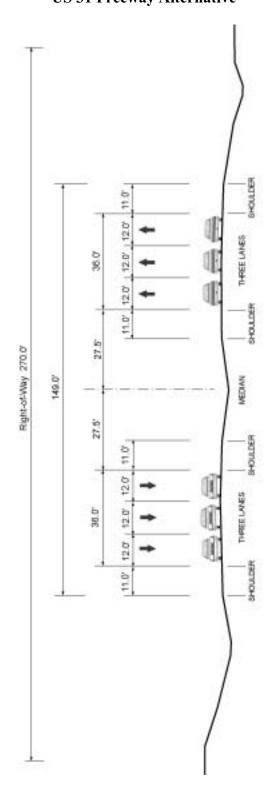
Proposed Typical Section US 31 Freeway Alternative
